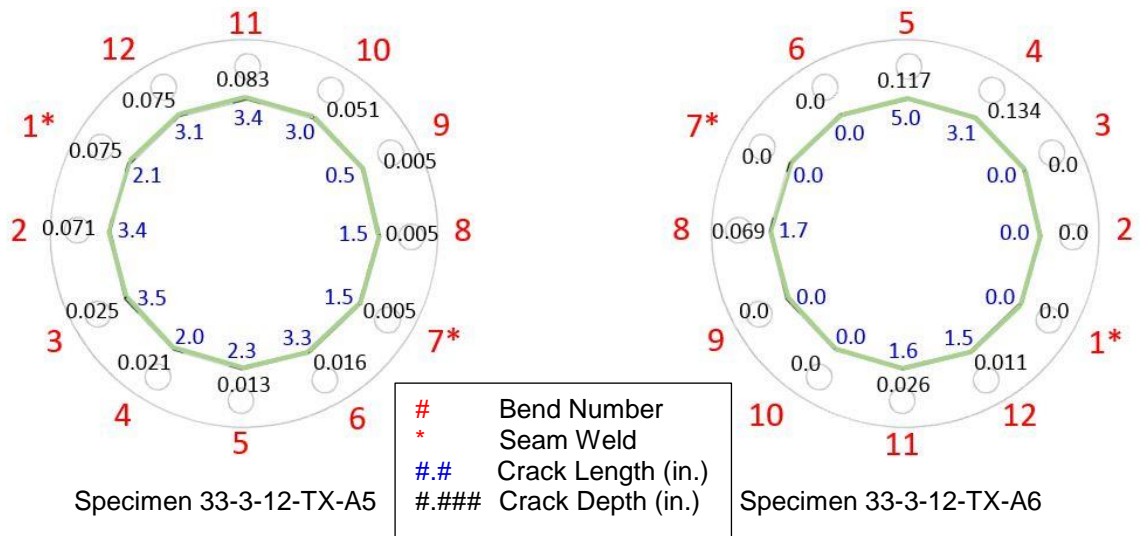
Specimens 33-3-12-TX-A5 and 33-3-12-TX-A6: Cracks after 37.7 Million Fatigue Cycles
